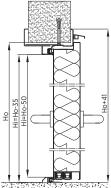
Installation of the ECO Tech single-leaf seamless door with a wrap-around frame without a thermal break to a masonry wall – vertical cross-section
